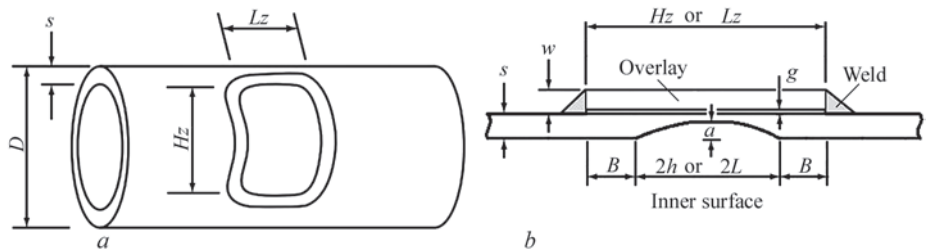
Scheme of reinforcement of the pipeline defective section by a welded external overlay: *a* — general view of the pipeline with the mounted overlay; *b* — section in the external overlay zone
